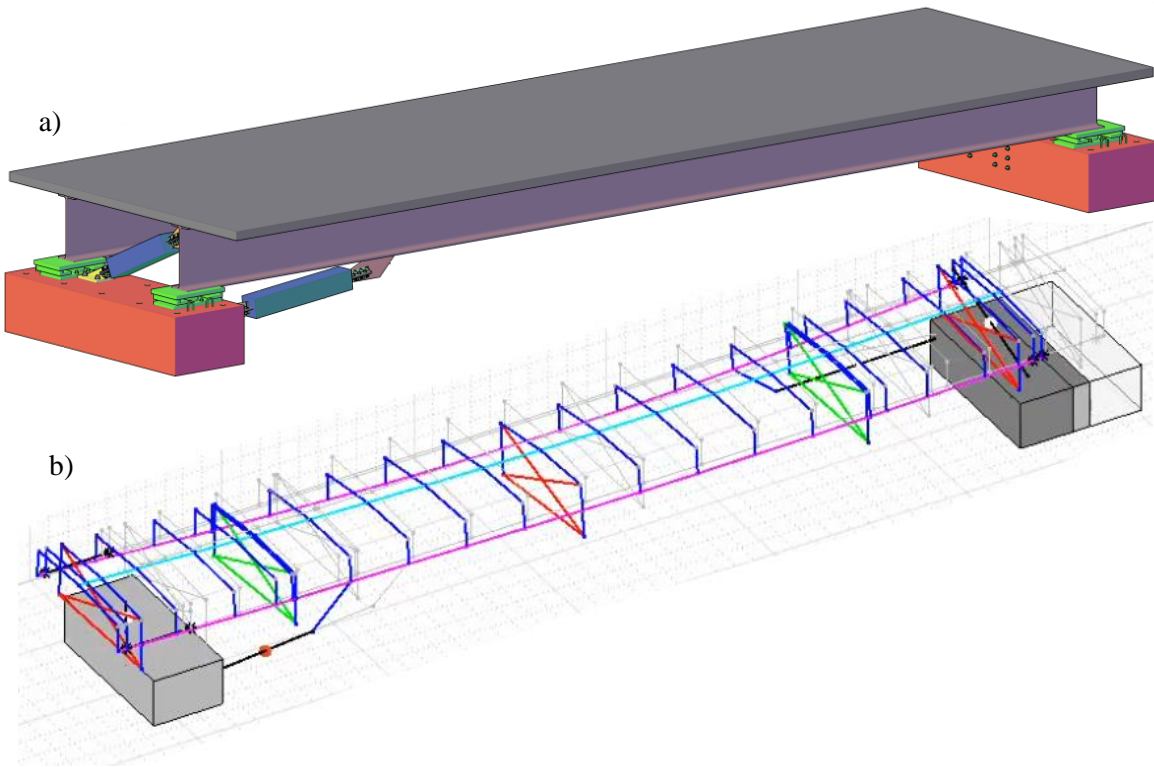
Specimen: a) 3D view; b) deformed shape of the detailed model
